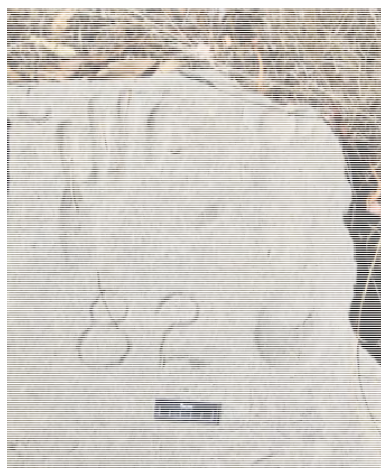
View on RHS of the concrete plinth showing a hand and footprint with '82'.
